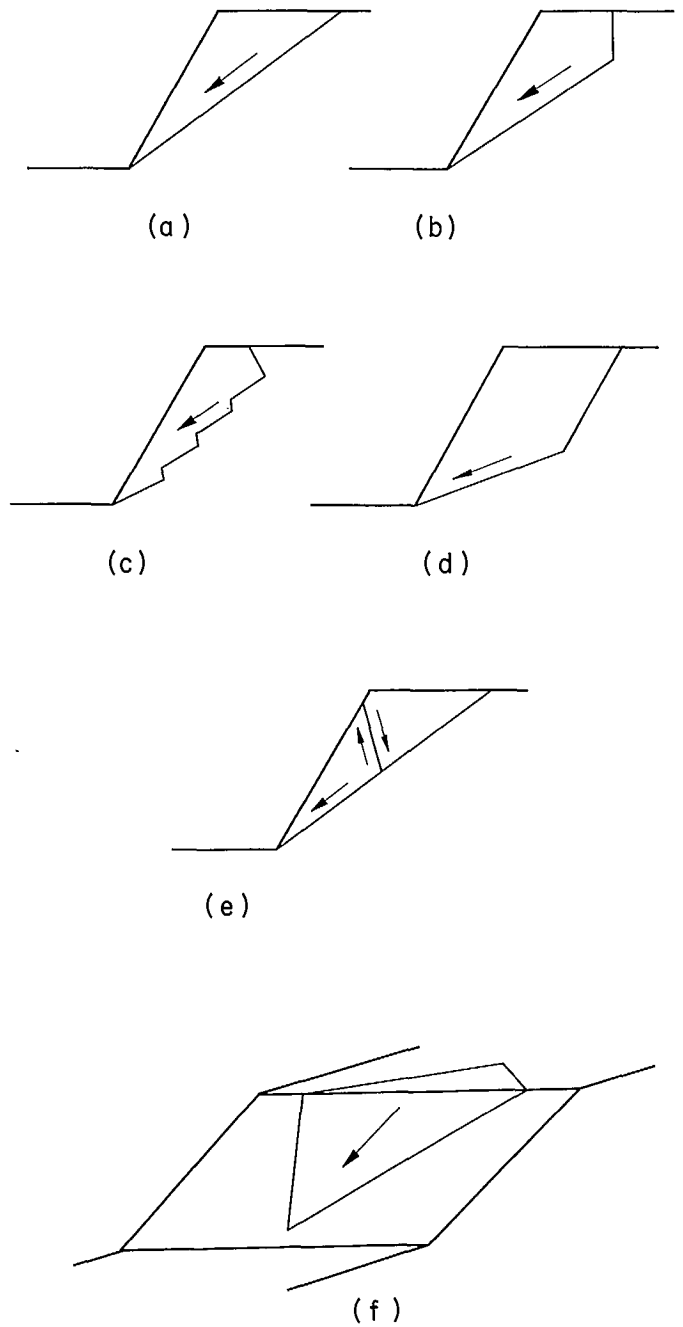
Plane shear instability modes: (a) one sliding plane and one block; (b) one sliding plane and a tension crack; (c) a series of short sliding planes with connecting cross joints; (d) two sliding planes; (e) a single sliding plane with the sliding block shearing into several blocks; and (f) two oblique sliding planes and a 3-d wedge.
